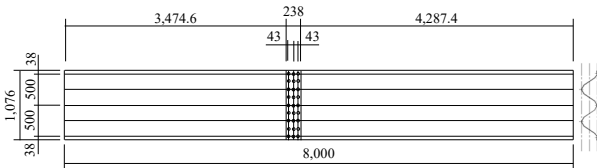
Specimen for the bolted connection (3 rows, with web bolt, Unit: mm)
